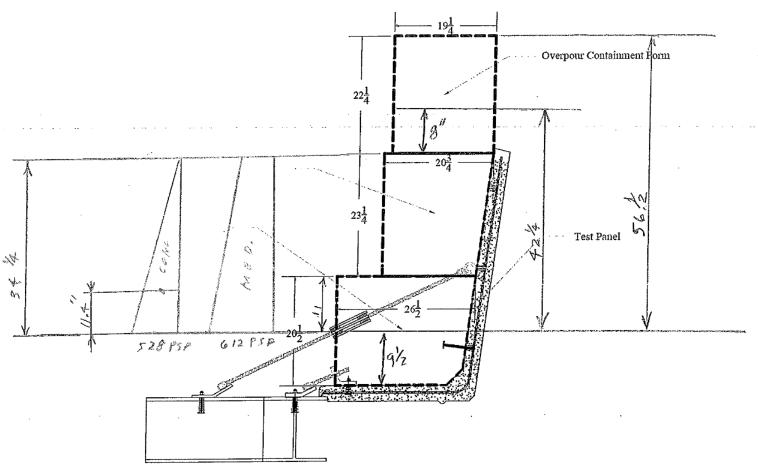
Containment Form dimensions for all Load Conditions (dimensions in inches)
